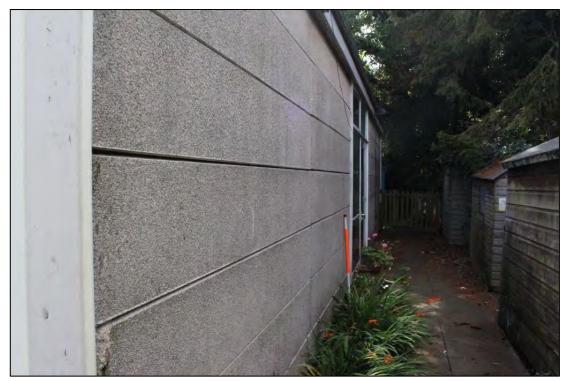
Overview of concrete cladding to eastern elevation of Room 23
